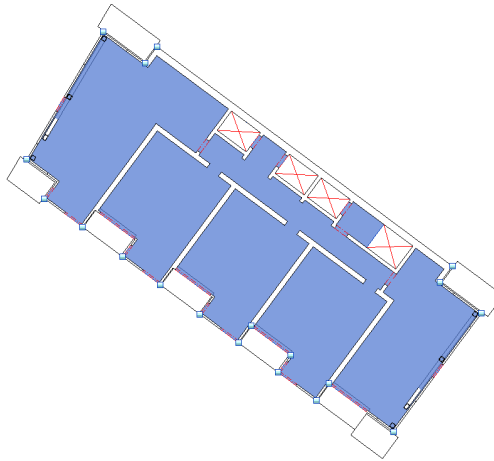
Choosing the floor plan which will represent the building geometry in the Dynamo script. The floor slab is marked with blue.
